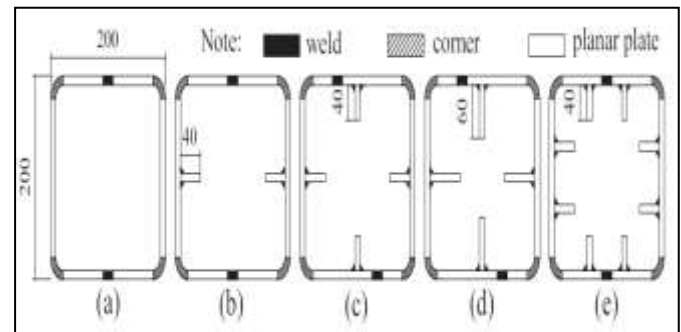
Cross-section geometry of Unstiffened and Stiffened sections
